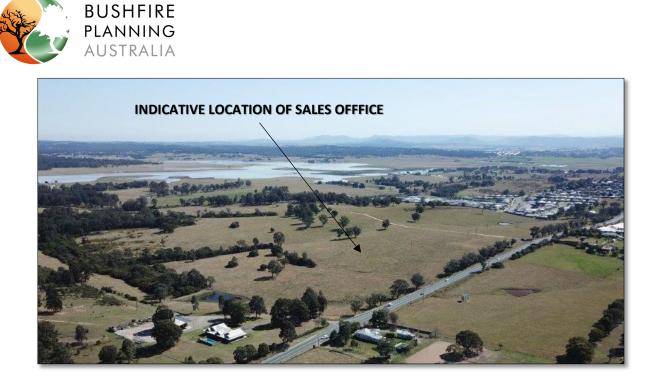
The proposed development will be constructed within Stage 1 of Precinct 1A
